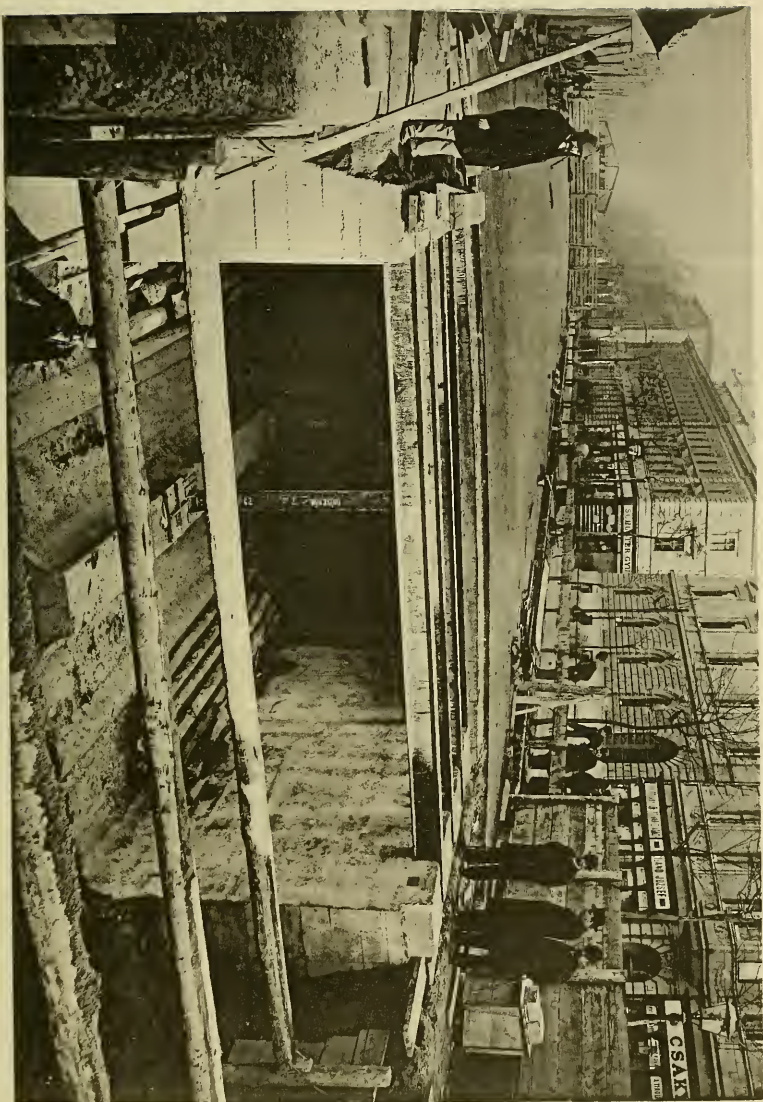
BUDAPEST SUBWAY. VIEW ON ANDRASSY STREET.
